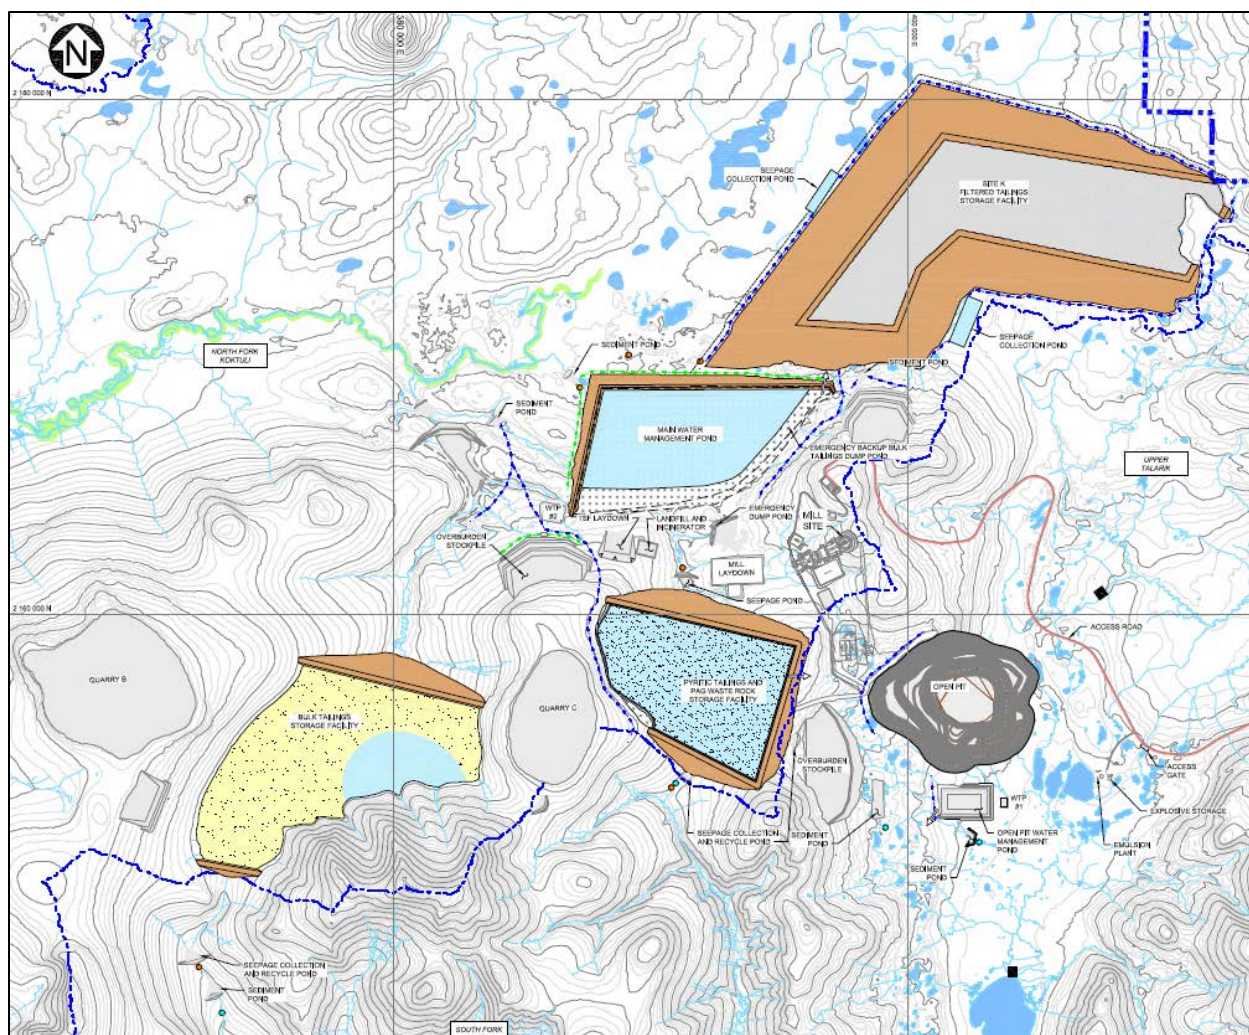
Conceptual Filtered Tailings TSF General Arrangement (Site K)
